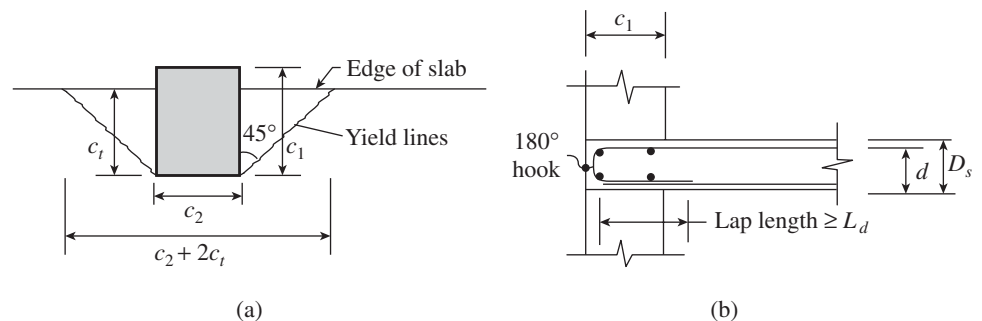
Effective transfer width at exterior slab-column connections (a) Effective width (b) Detailing of reinforcement
